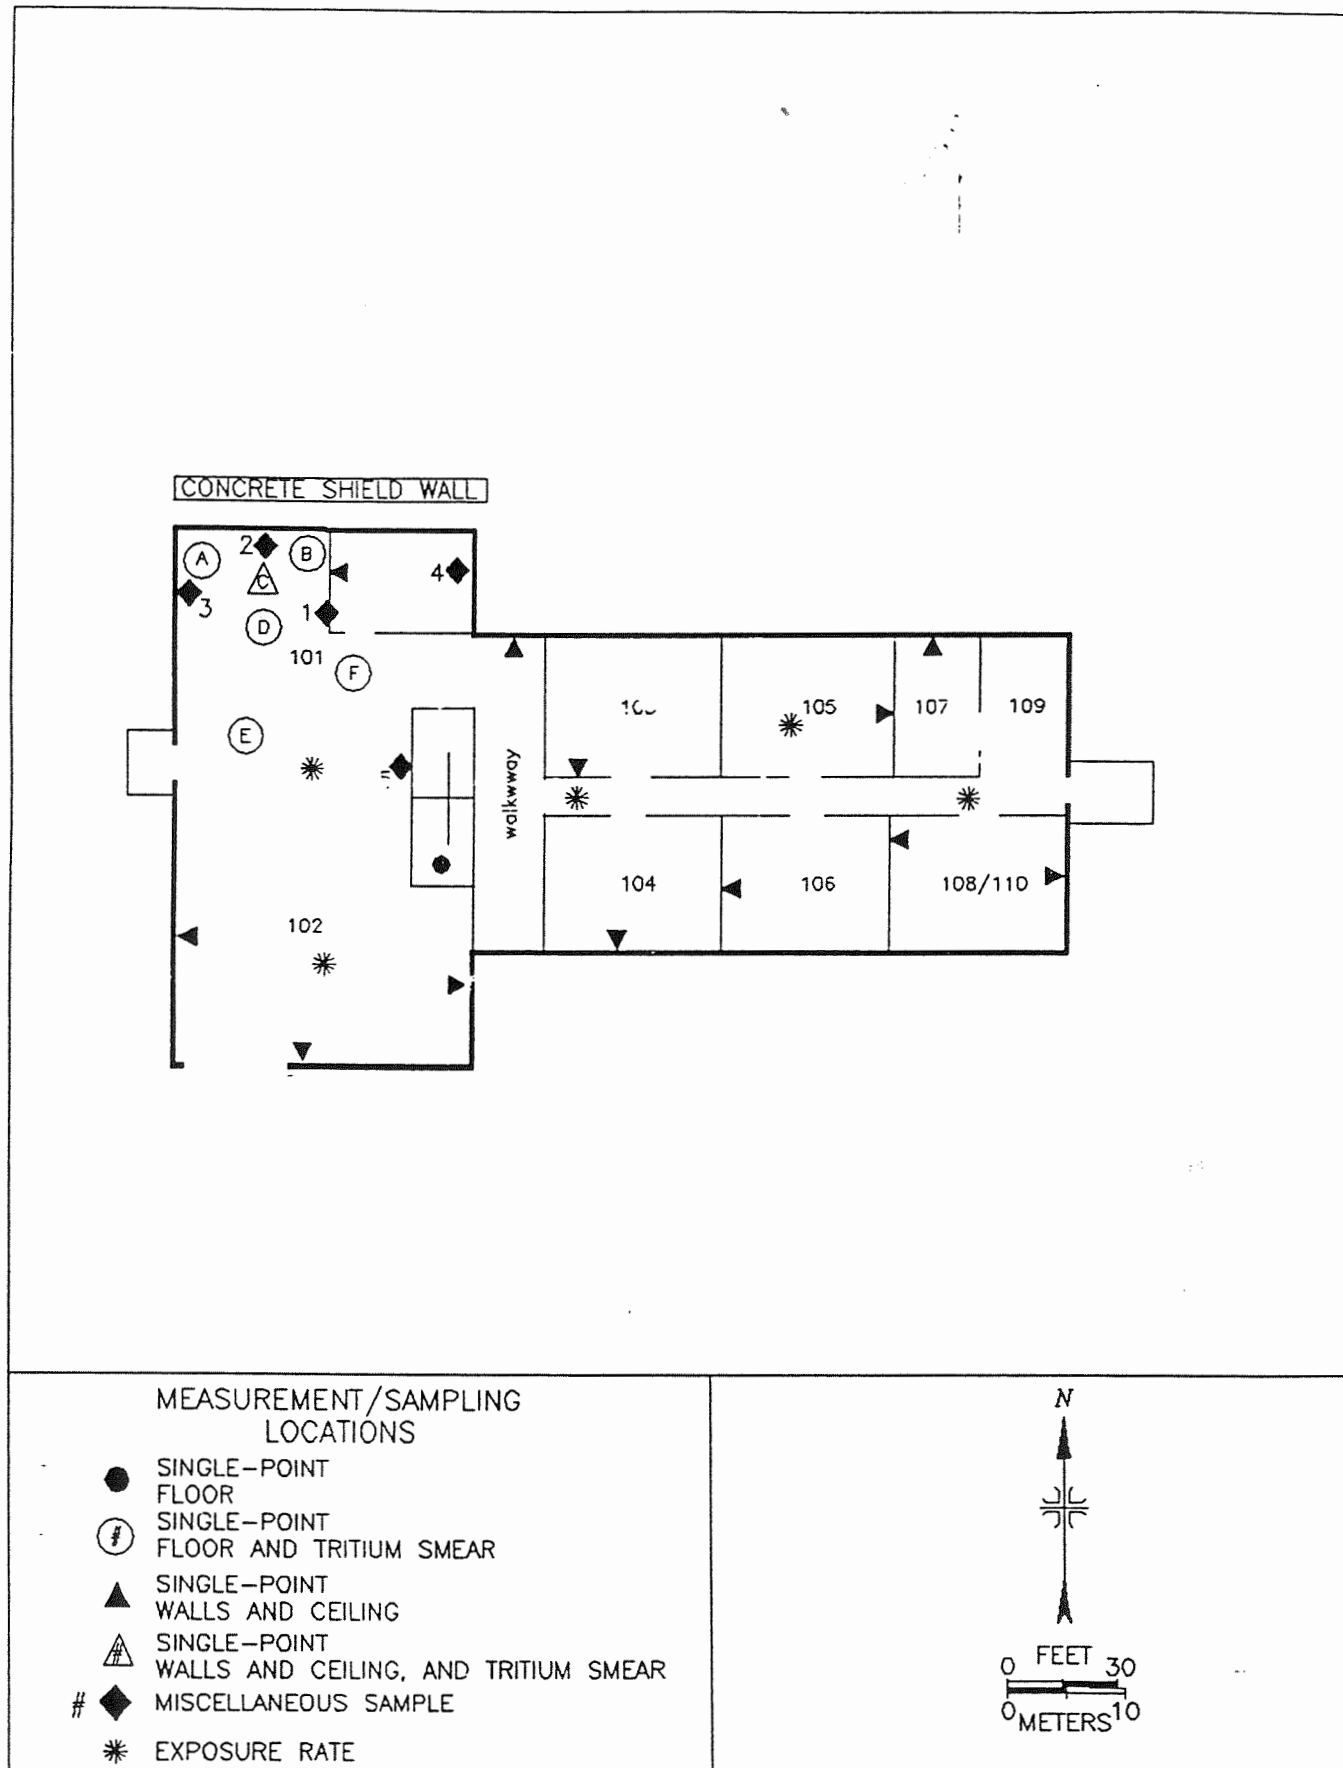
Building T030 – Floor Plan and Measurement and Sampling Locations
